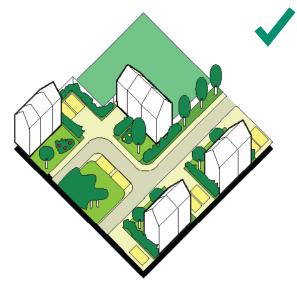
Avoid on-street car parking to not diminish the visual quality of the street
